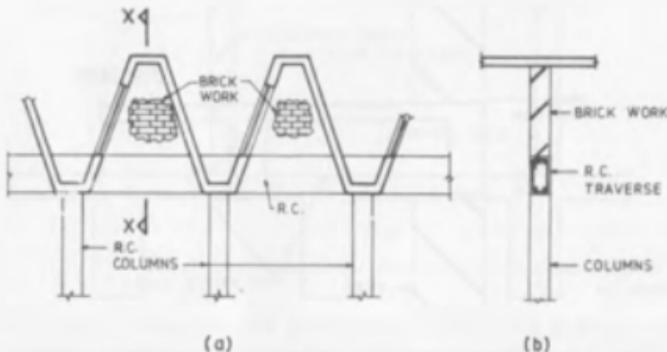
Northlight folded plate failure. (a) Elevation of traverse; (b) Section X-X.
